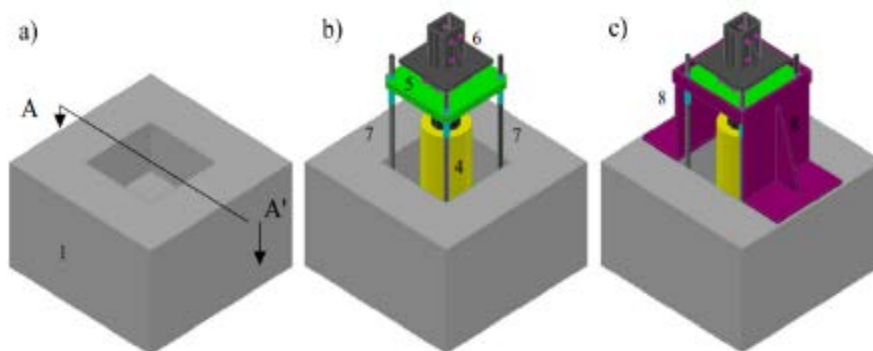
Concrete footing schematic view (Craveiro et al. 2016).
